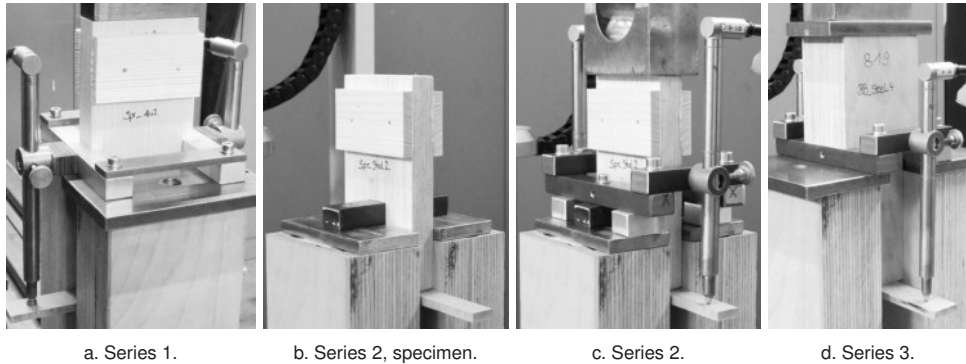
Test setups: embedment tests with external and internal rectangular fasteners.
